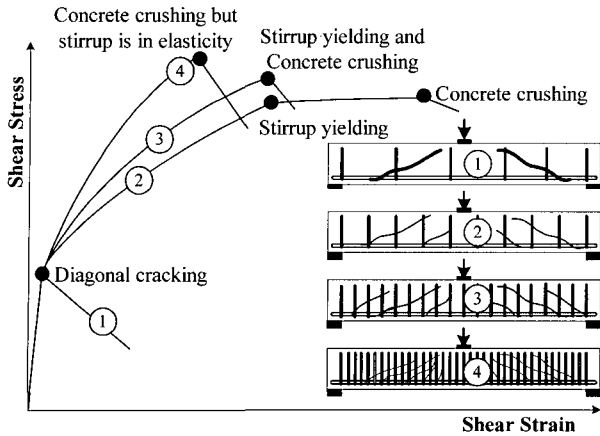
Four shear failure modes of reinforced concrete beams
